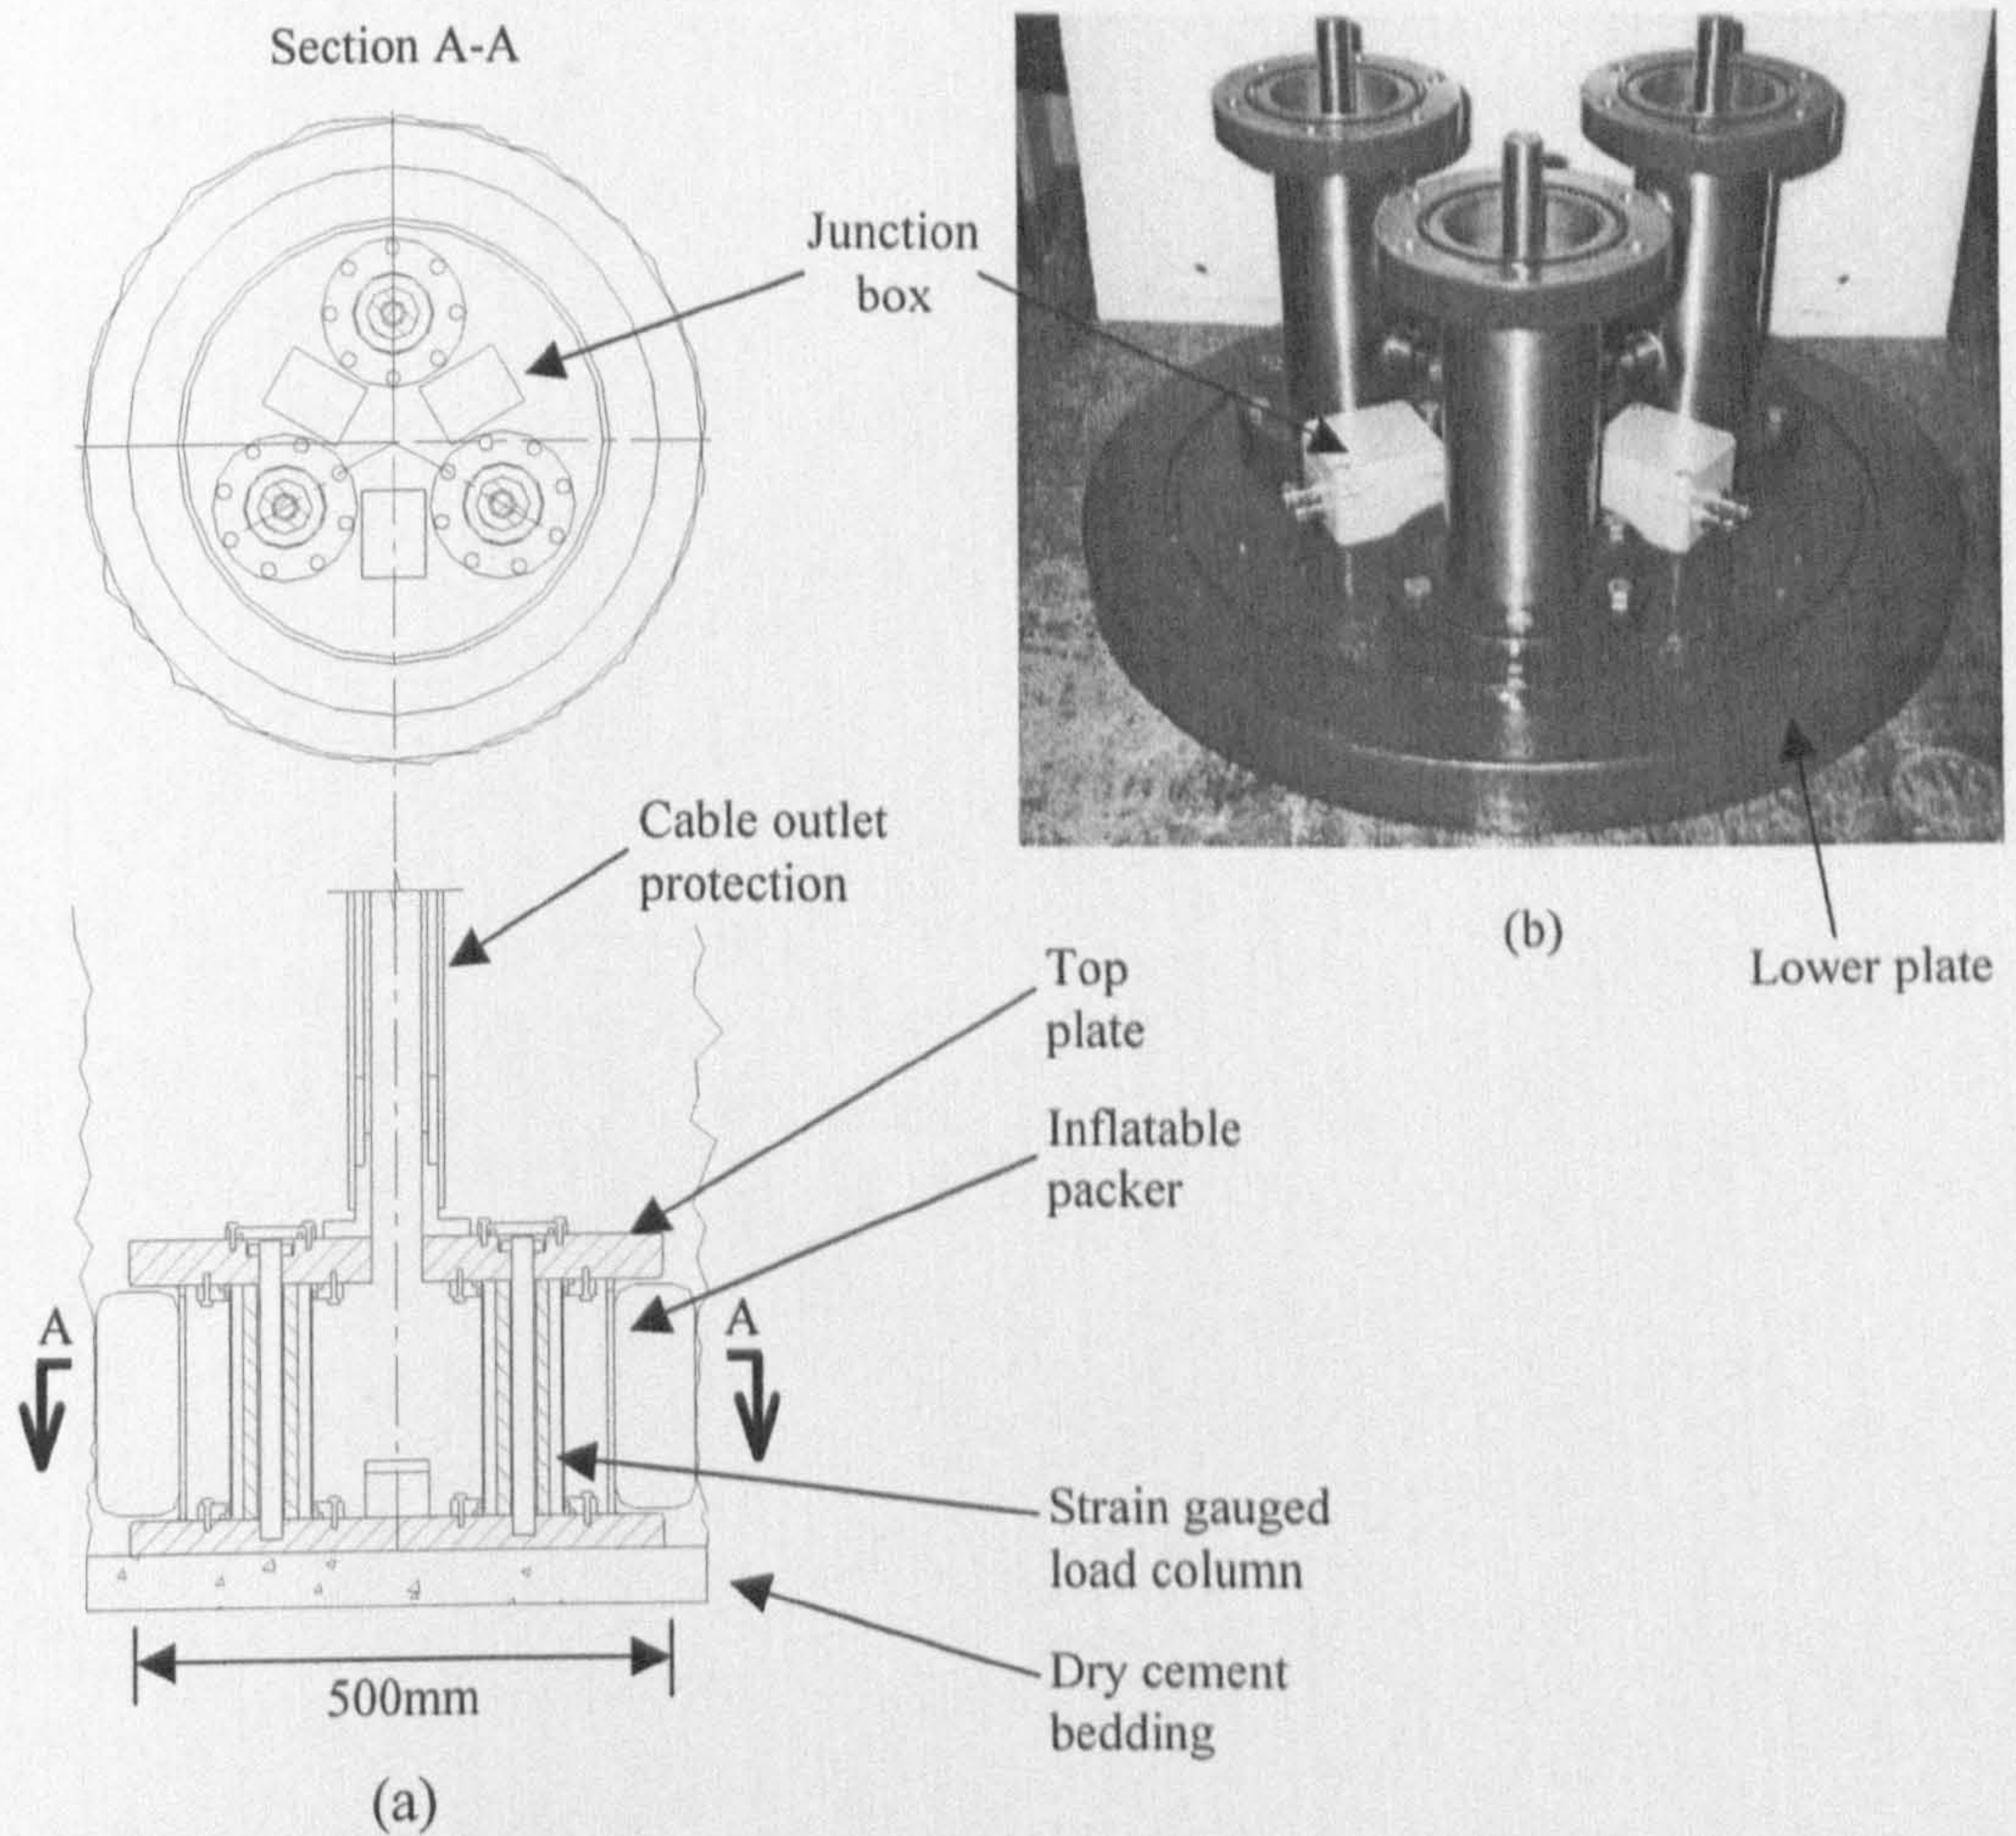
, Pile tip load cell details: (a) As installed, (b) Showing protective cylinders with o-ring sealed retaining rings bolted to lower plate.
